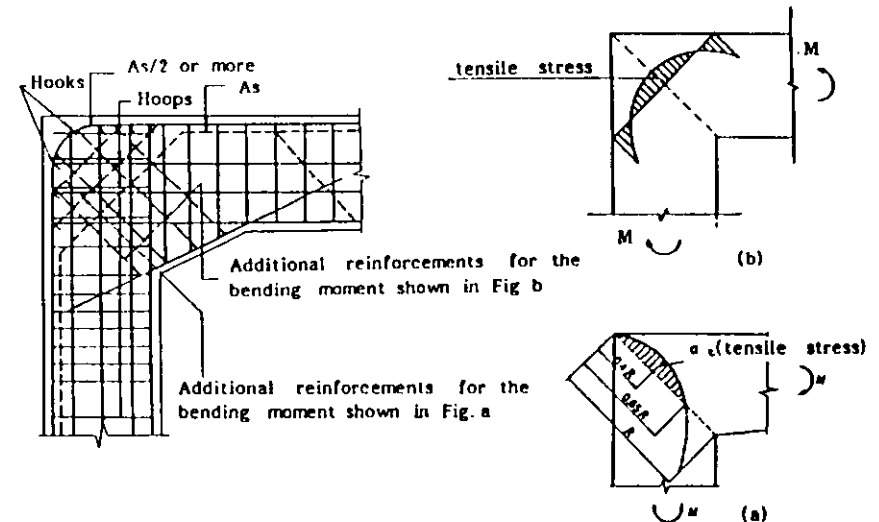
Arrangement of Reinforcements at End Joint of Rigid Frame Members
